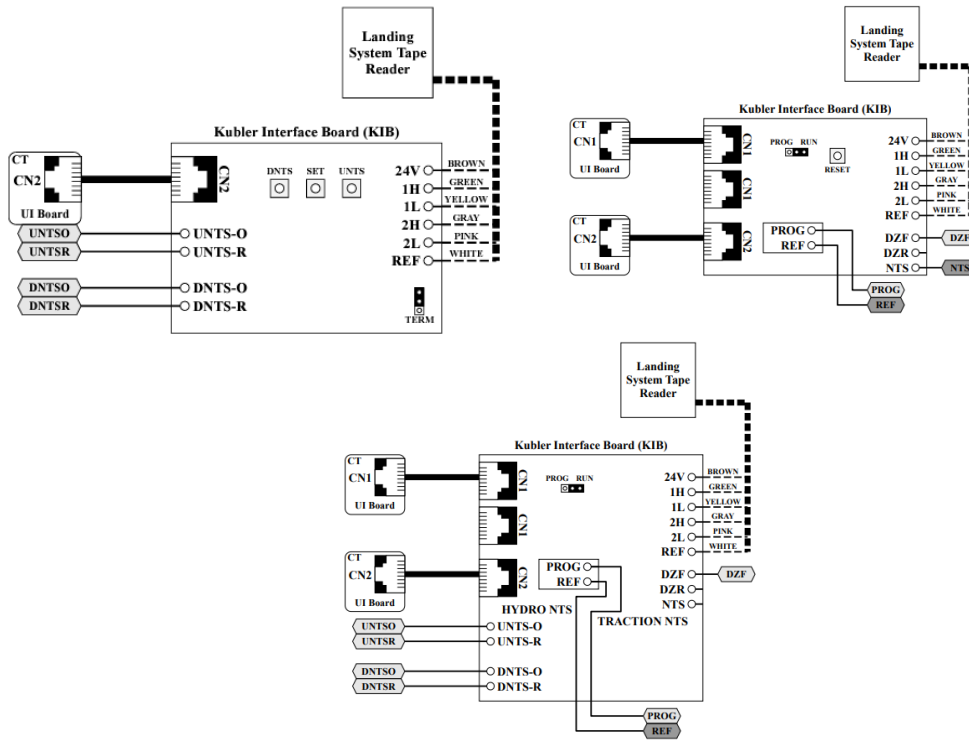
Sensor head connection to KIB Hydro board (Top Left), KIB Traction board (Top Right) and KIB H/T Board (Bottom)
